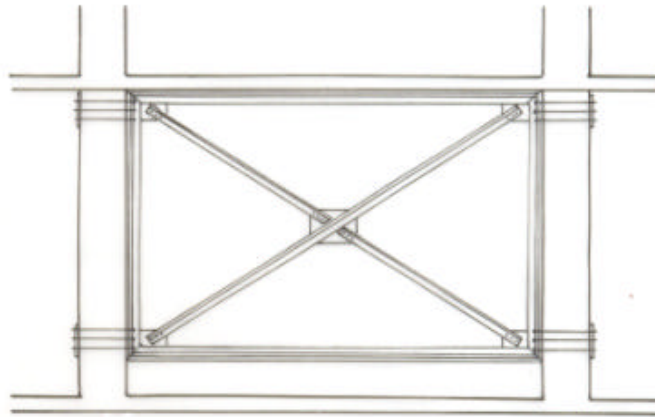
Placing diagonal steel bracings within the frame [46]
